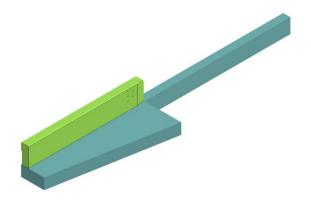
Parapet, Moment Slab, and Wingwall.
